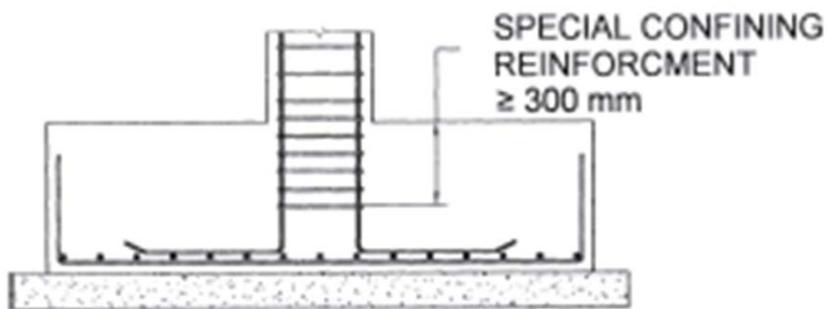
PROVISION OF SPECIAL CONFINING REINFORCEMENT IN FOOTING
